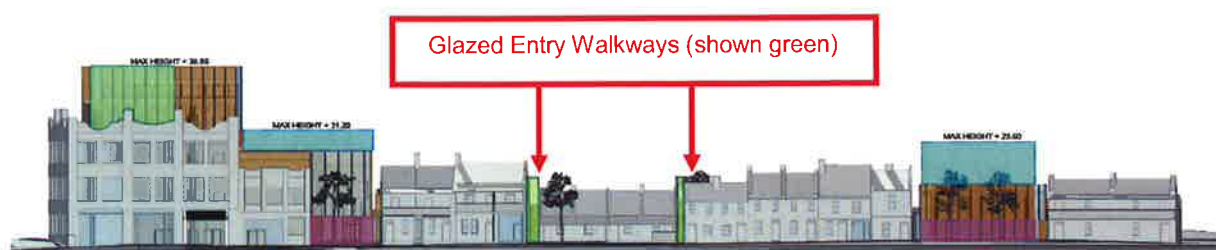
Kensington Street Elevation showing the proposed glazed entry walkways (source: TZG)
